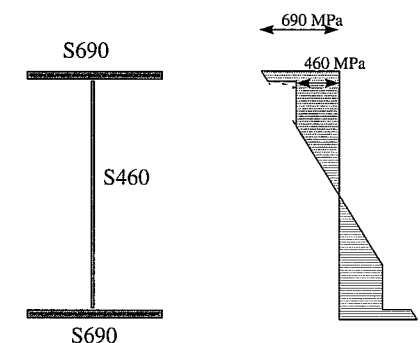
Example of hybrid girder with web of lower strength than the flanges
